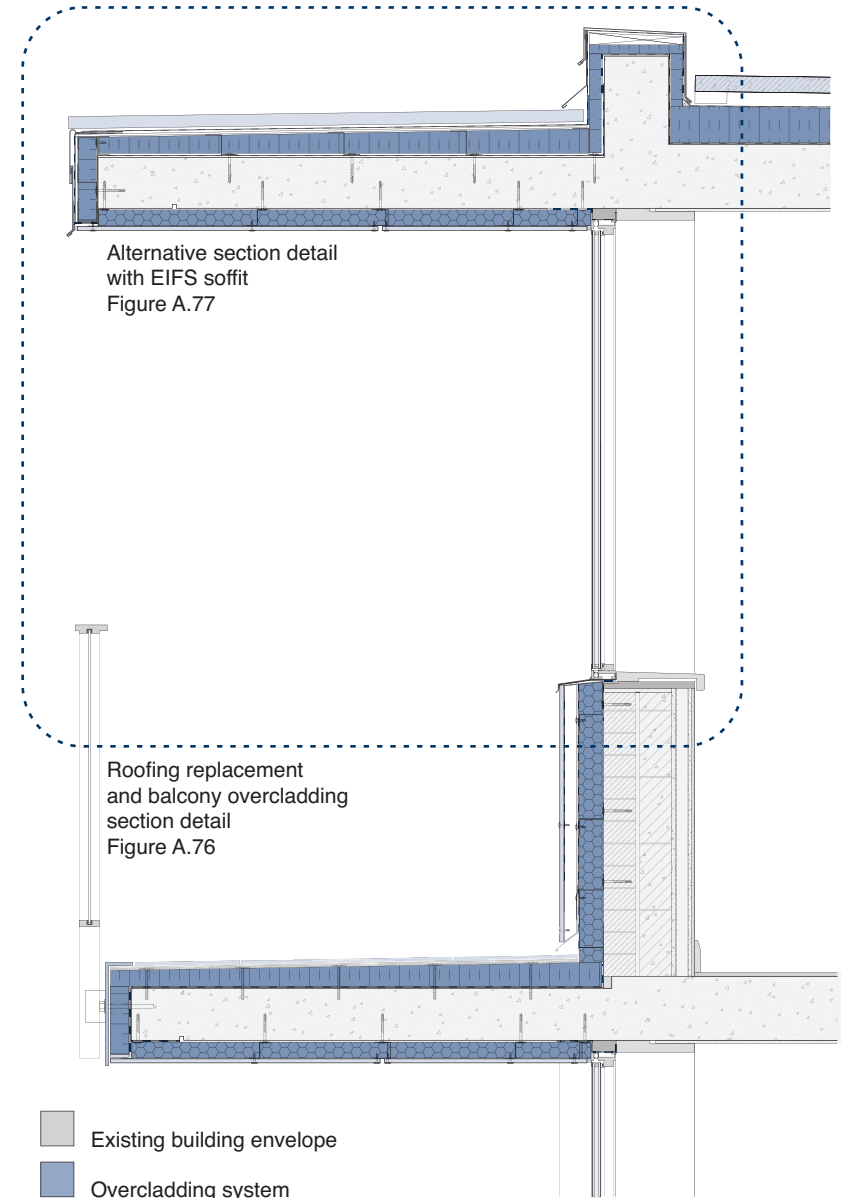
Section view of a roofing replacement and balcony overcladding assembly with corresponding detail drawings denoted.
